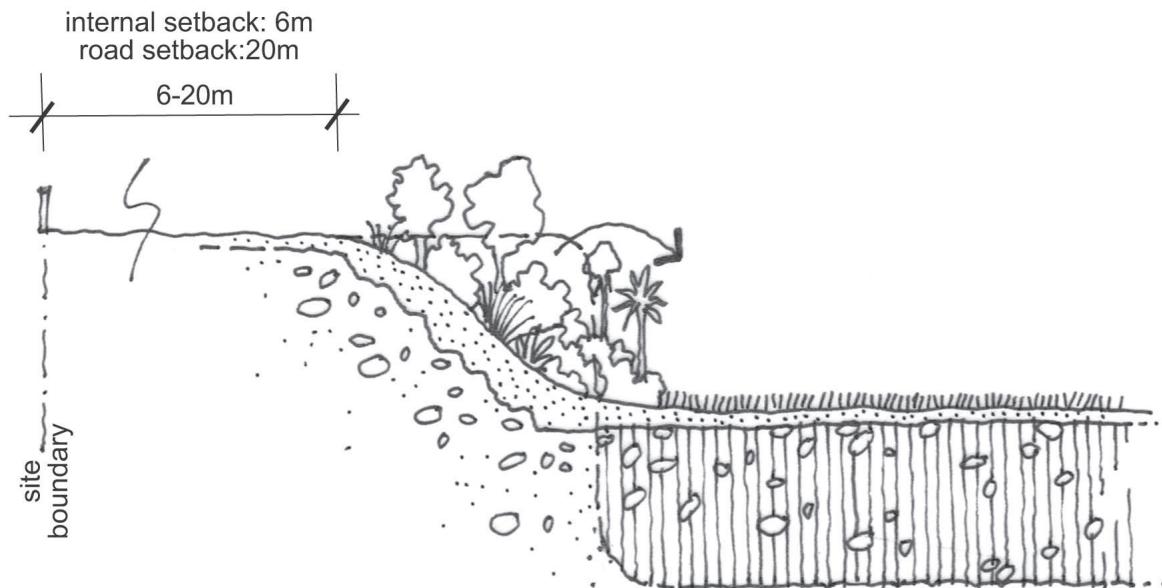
Cross Section 1: (1v:3h slope without fill)
